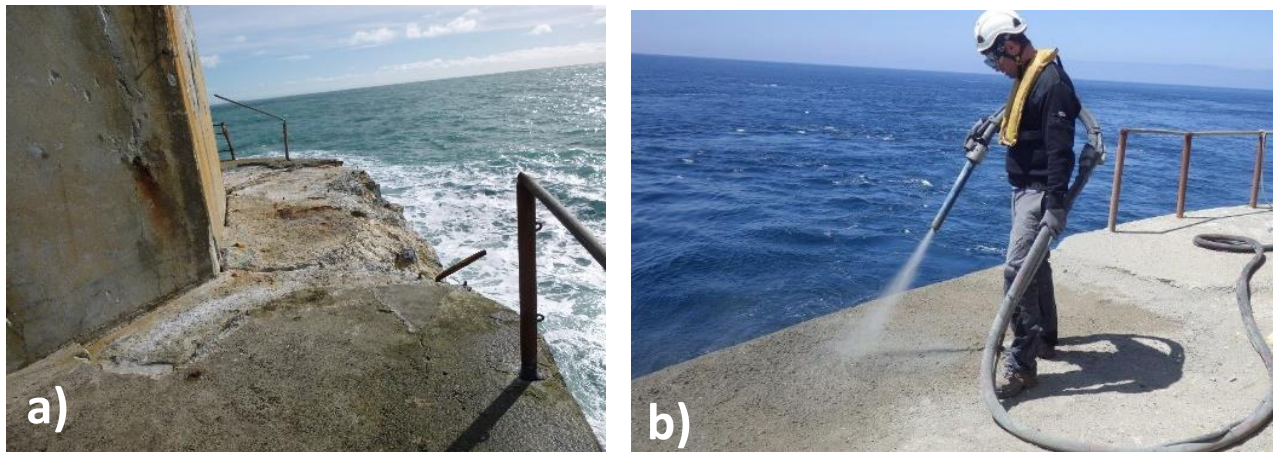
Base Platform: a) Spalling and radial cracks [32]; b) Shotcrete application [33]
